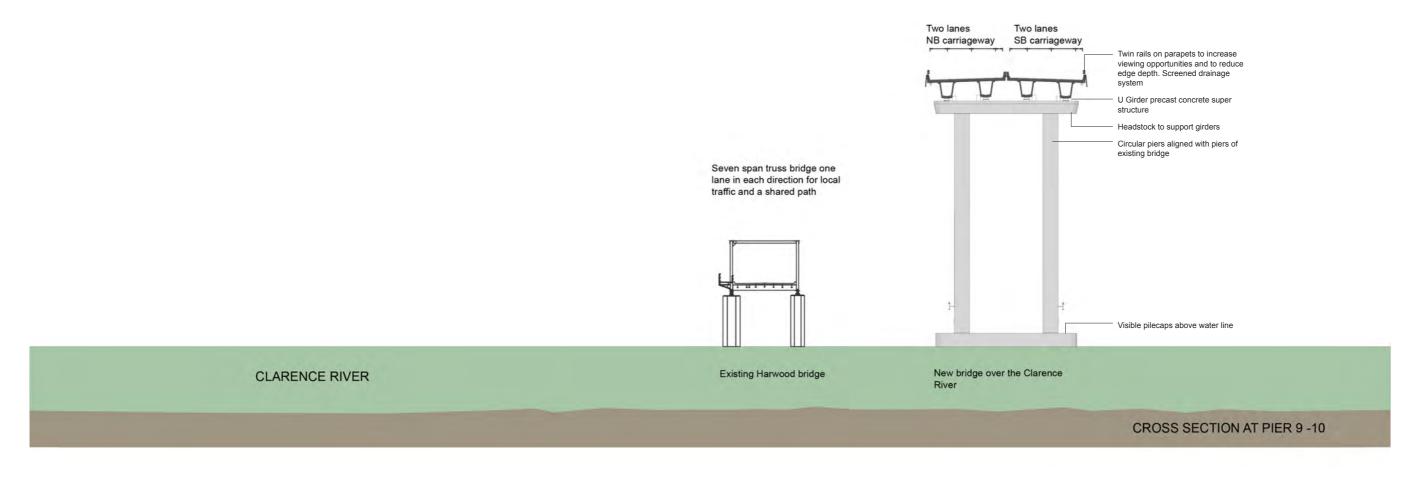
Elevation of the bridge over Clarence River at Harwood
